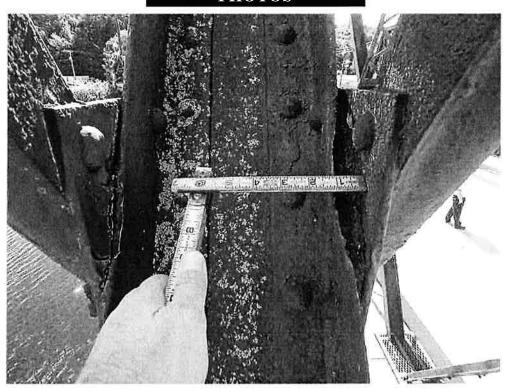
North tower outer truss, member U8-L6 at M7 – the edge of the inner flange has knife edge remaining thickness.
